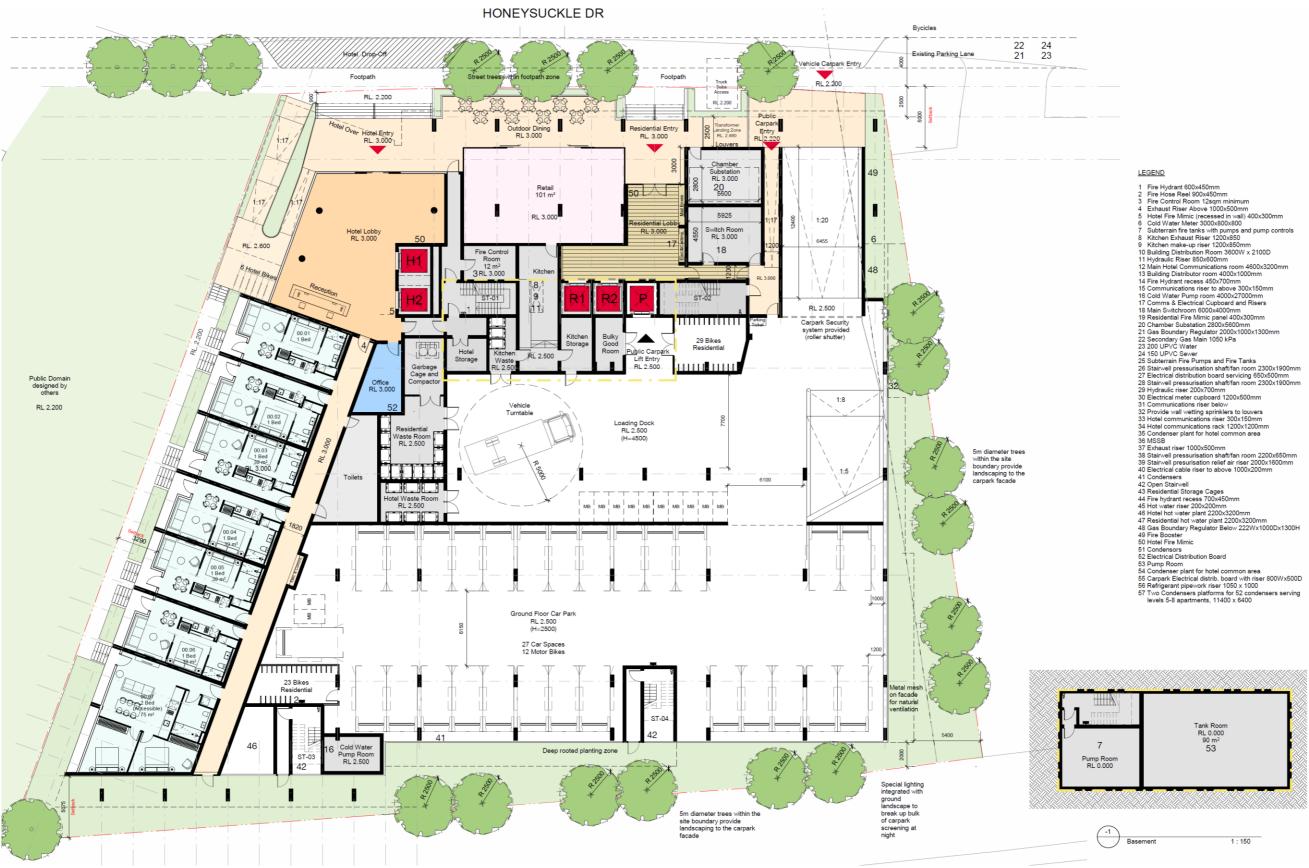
Excerpt of Current Ground Floor and Basement plan for the development.
